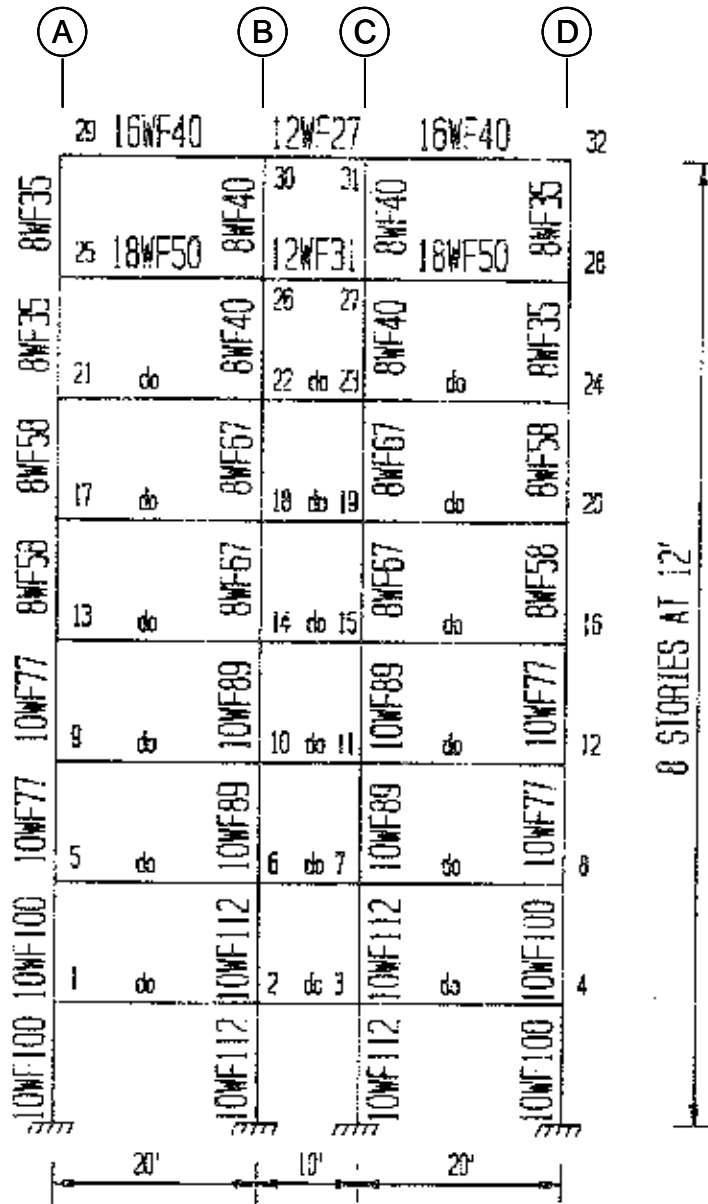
Elevation view of frame Boe (Boe 1952)
